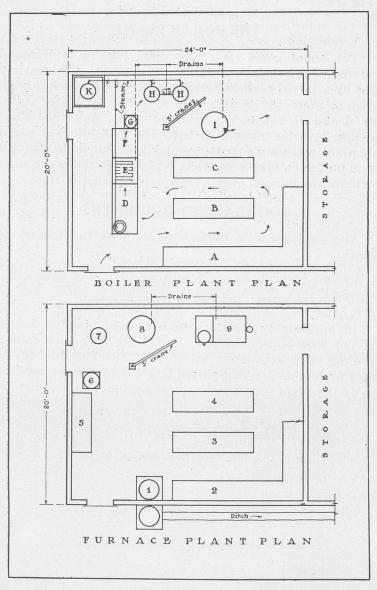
Boiler Plant Plan:—A, B, C, work tables; D, Capping tables with brine tank; E, Blanching vat; F, Tipping table; G, Can crate; H-H, Retorts; I, Cooling vat; K, Boiler.
